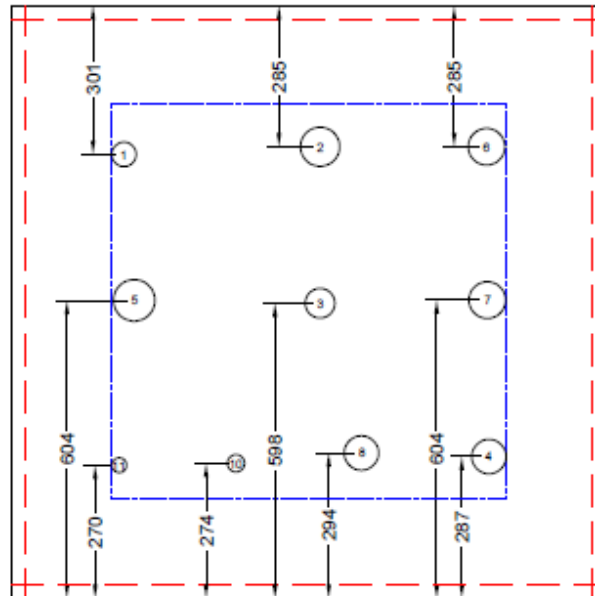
Test 2 – Elevation – Aperture Location Fire Side – Horizontal.pdf
